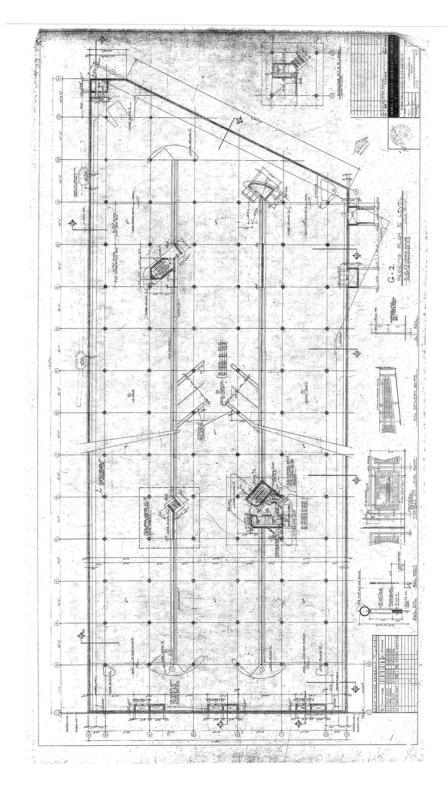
Mayflower Building - Original Typical Parking Level by Thomas E. Stanley Architects Engineers, dated May 1964.
